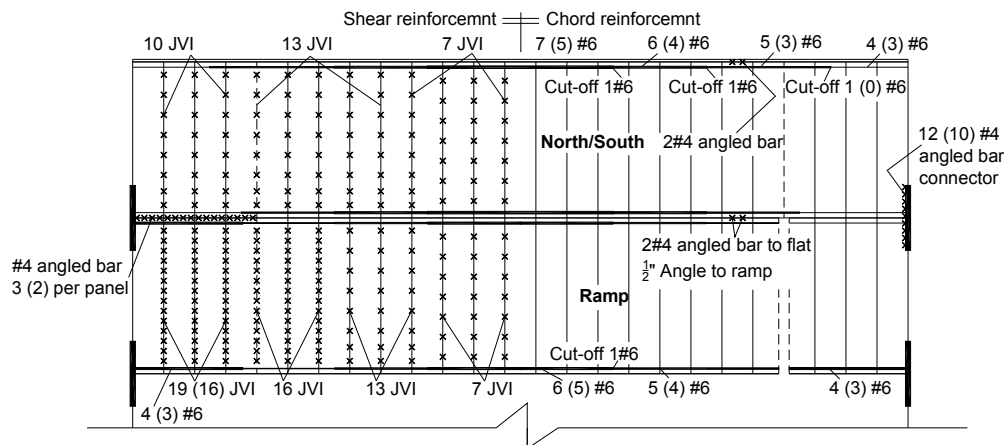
Diaphragm reinforcement design for design example 1B.
